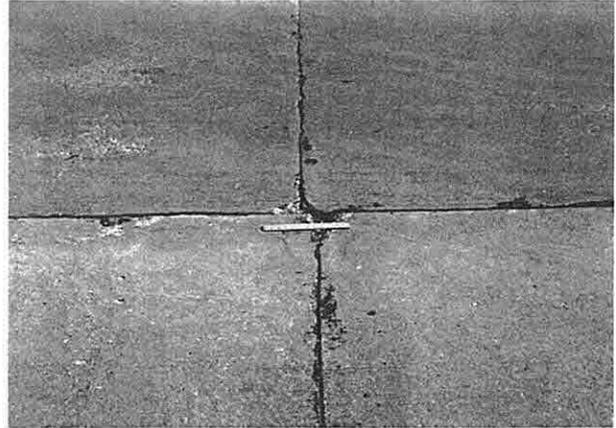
Low-Severity Spalling, Corner
